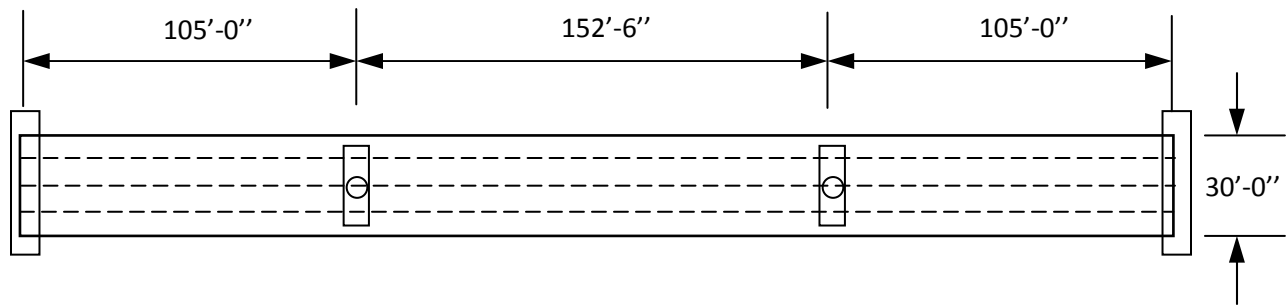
Plan of 3-Span Benchmark Bridge No. 2.
